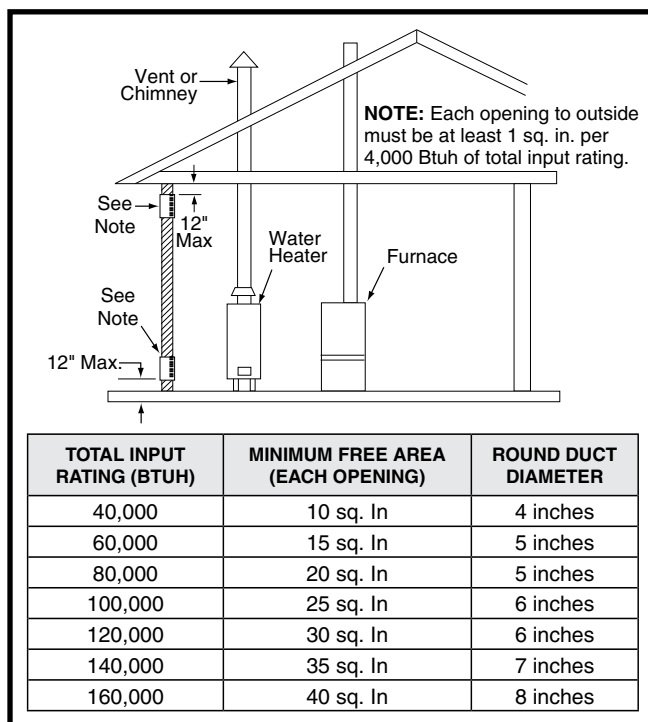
Combustion Air Drawn from Outside Through an Exterior Wall
